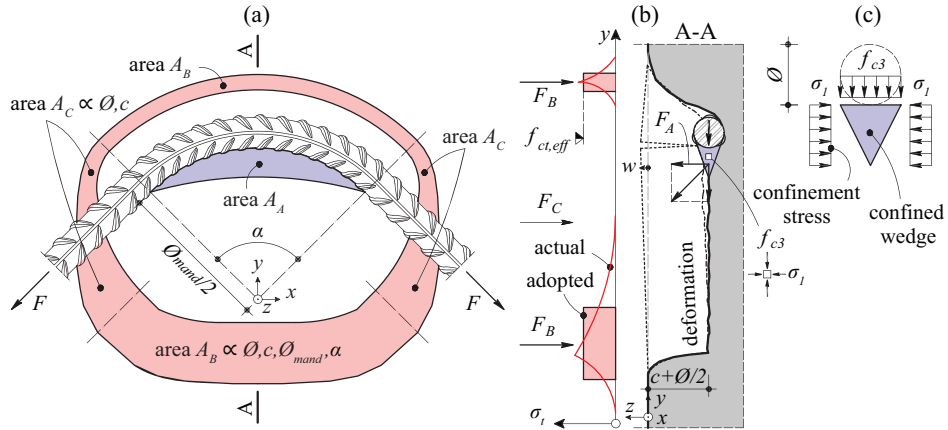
Mechanical model: (a) plan view with spalled areas and considered areas in tension; (b) detail of stresses and forces; and (c) detail of the concrete wedge with the confinement stresses.
